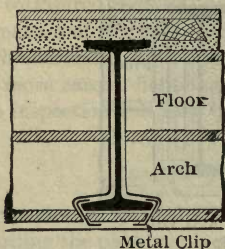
Beam Soffit Protection, Calvert Building, Baltimore Fire.
